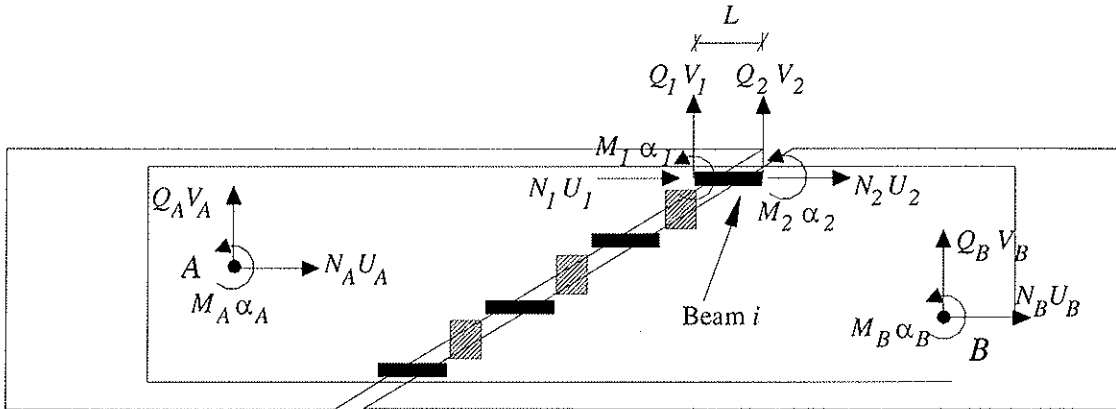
Plate element with 4 steel beams in the plate main direction and 3 steel beams perpendicular to the plate main direction.
